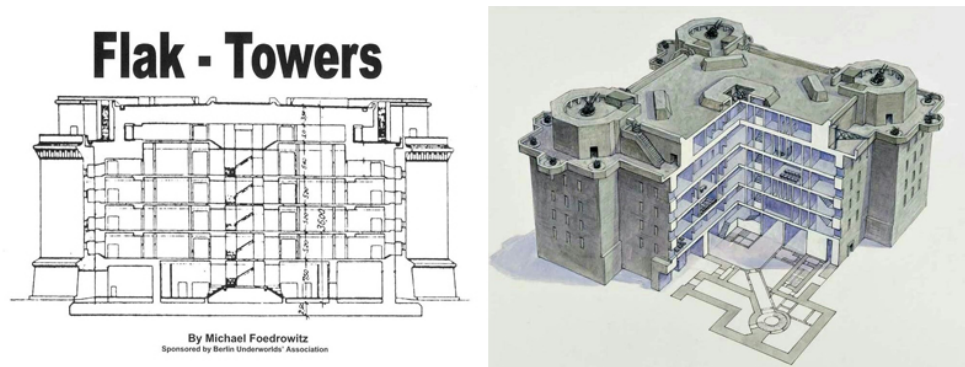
Cut-through. The first-generation towers were designed to gain maximum stability through independent load-bearing properties in outer walls as well as in the inner storey partitions. With its steel reinforced concrete walls and ceiling several meters thick, all poured in one process without vulnerable joints, the outer casing was virtually impenetrable for all but a direct hit from a very large bomb. Thus, a collapse of a wall or storey partition would not affect the overall integrity of the tower, a fact clearly illustrated during postwar demolition attempts. Source left; Michael Foerdrowitz, right: weaponsandwarfare.com
